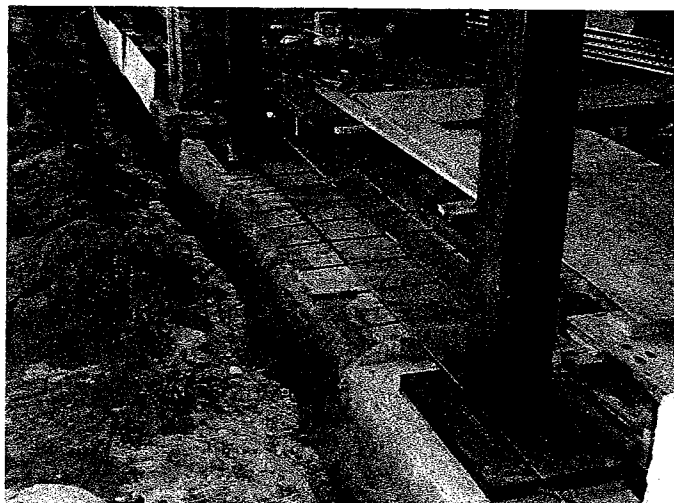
Steel Bent Plate at grid A/3.5 entrance with welded deformed dowel anchors.
